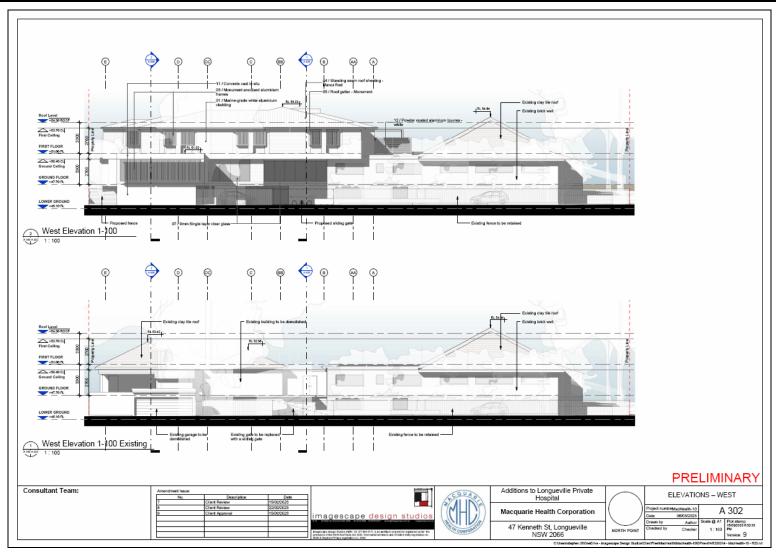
Pages 13 thru 17 illustrates the as proposed now Version 9 Floor Plans & Elevation.
